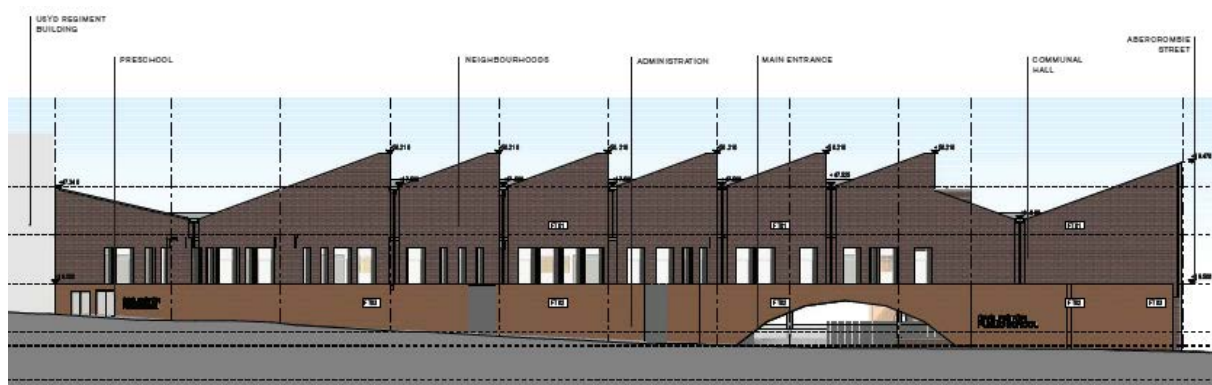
West elevation—Golden Grove Street elevation. (Source: FJMT, April 2020)
